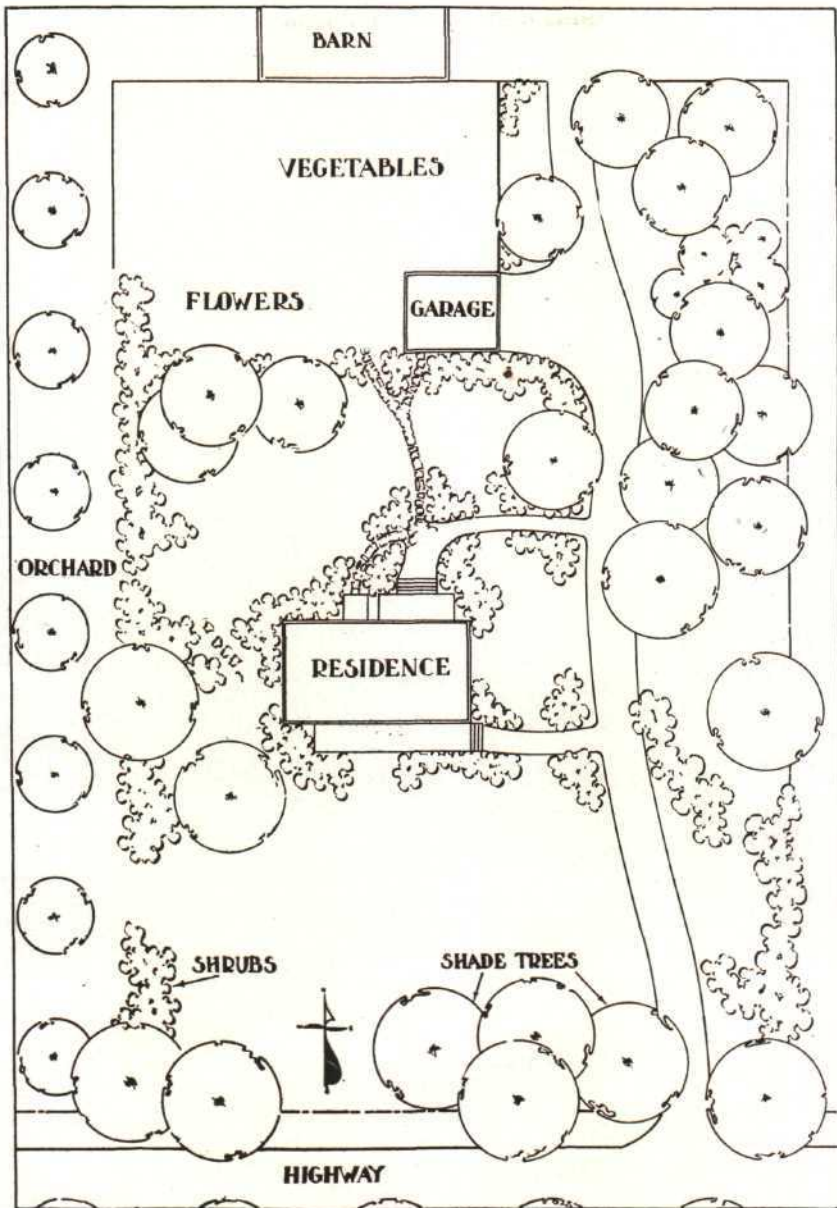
A design of walks, drives and plantings of a farm grounds where the buildings had already been placed.
